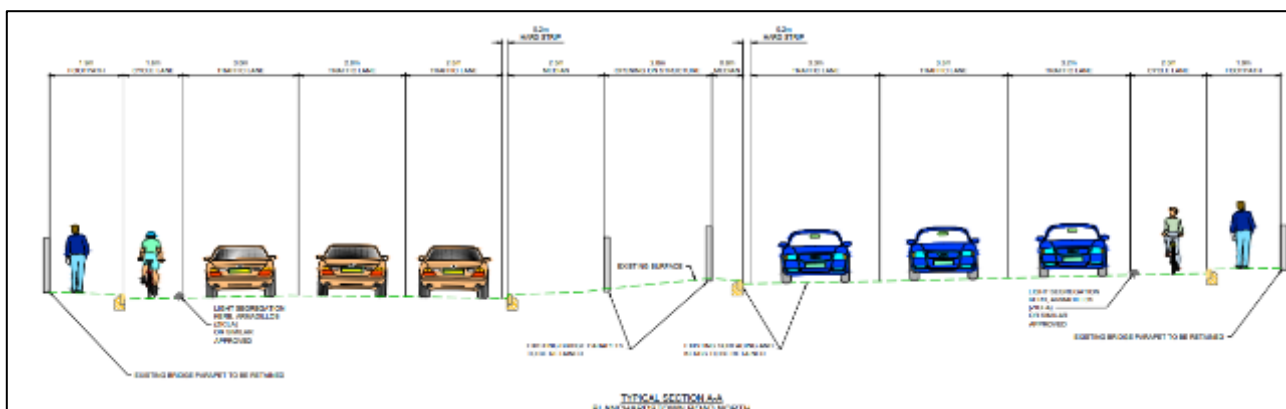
Cross-section on Blanchardstown Road North overbridge
